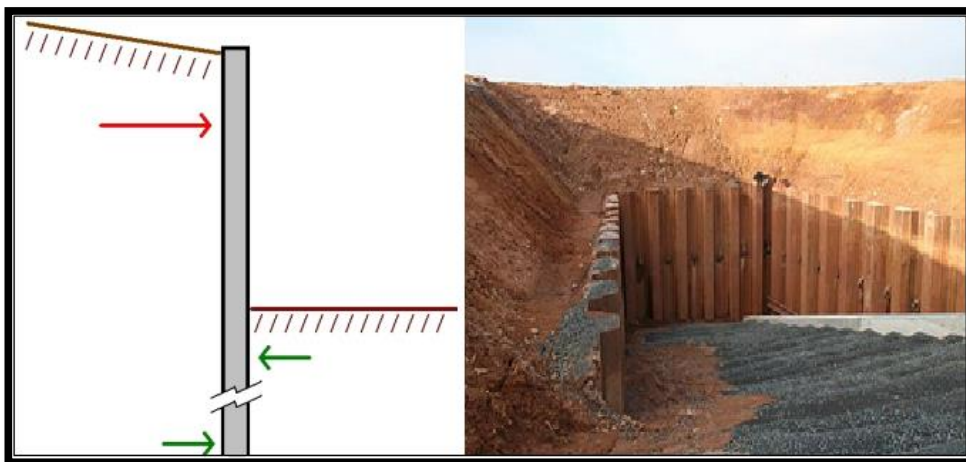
Sheet piling wall. (<http://www.wikiwand.com/>)
